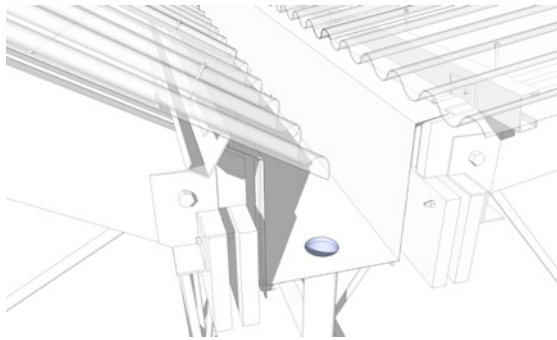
Custom-made steel gutter and uPVC downpipe
